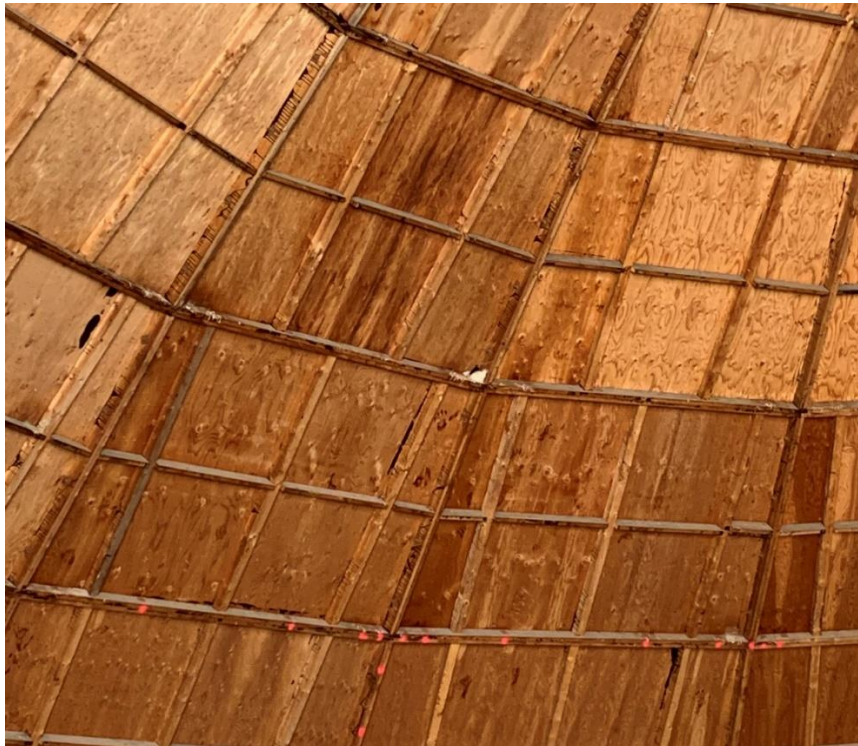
Closeup of Active Barn Swallow Nest in MTO Dome Building
